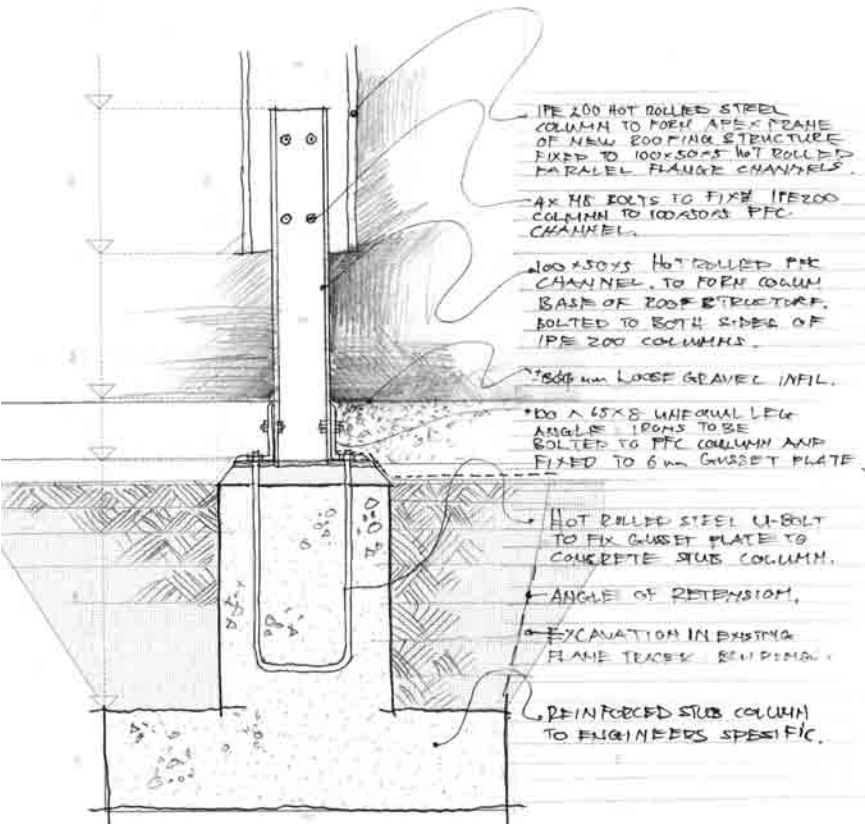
New roof column foundation detail, nts (Author, 2011)
